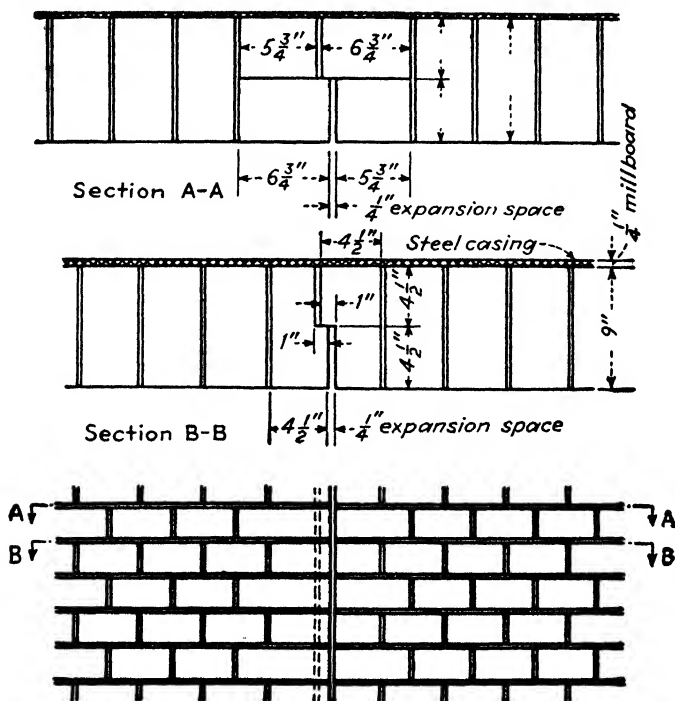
Expansion joint arrangement, 9-in. thick insulating firebrick wall. (Courtesy of Babcock & Wilcox Company.)
